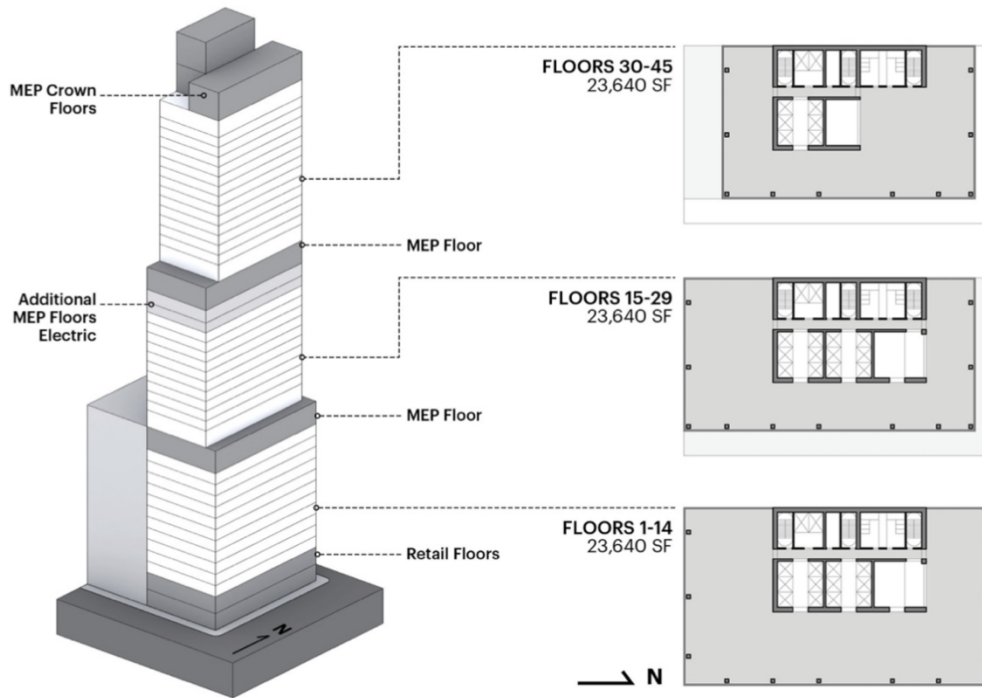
Schematic floorplan and axonometric view of the tower. Source: MIT SRE_pset 3
